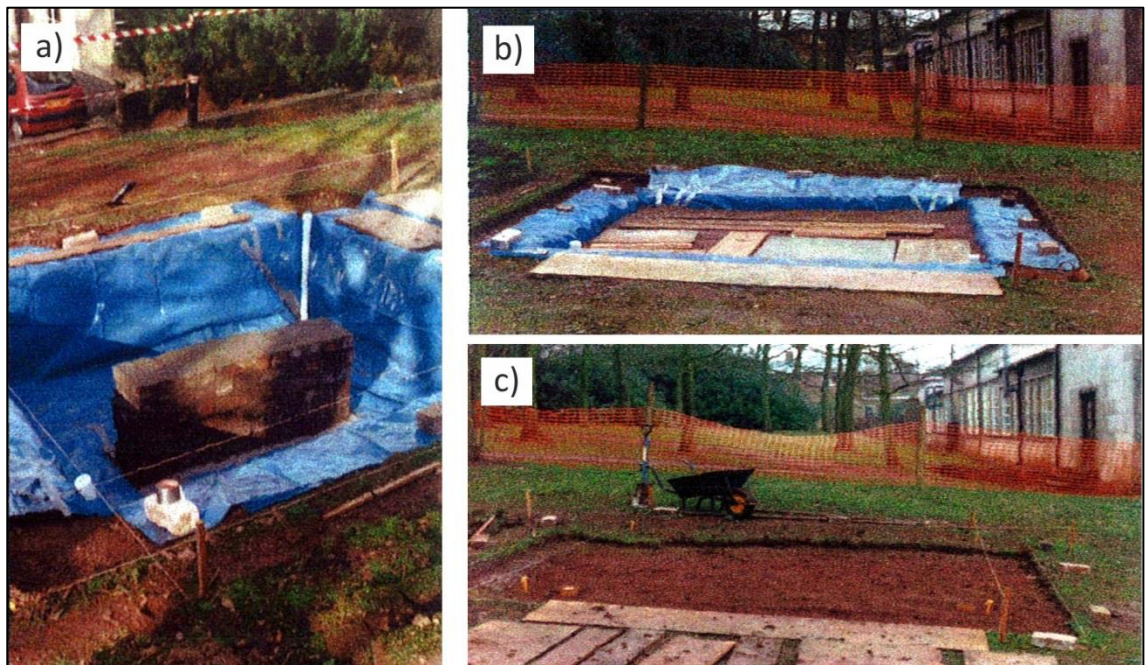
Three stages of the pit 'test site' construction, a) brick wall and impermeable membrane, b) gravel fill stage, and c) backfilling of soil before ground surface levelling (adopted from Cassidy, 2001).
